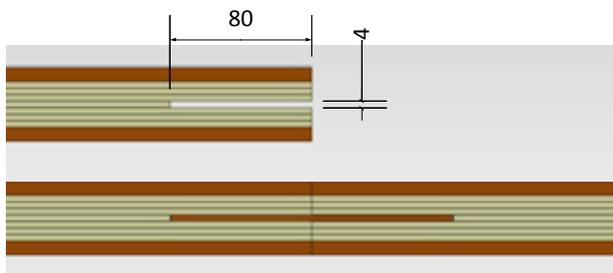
Plyboard panel; Top: Periphery slot; Bottom: Spliced panels using a glued board tongue joint. Dimensions in mm.
